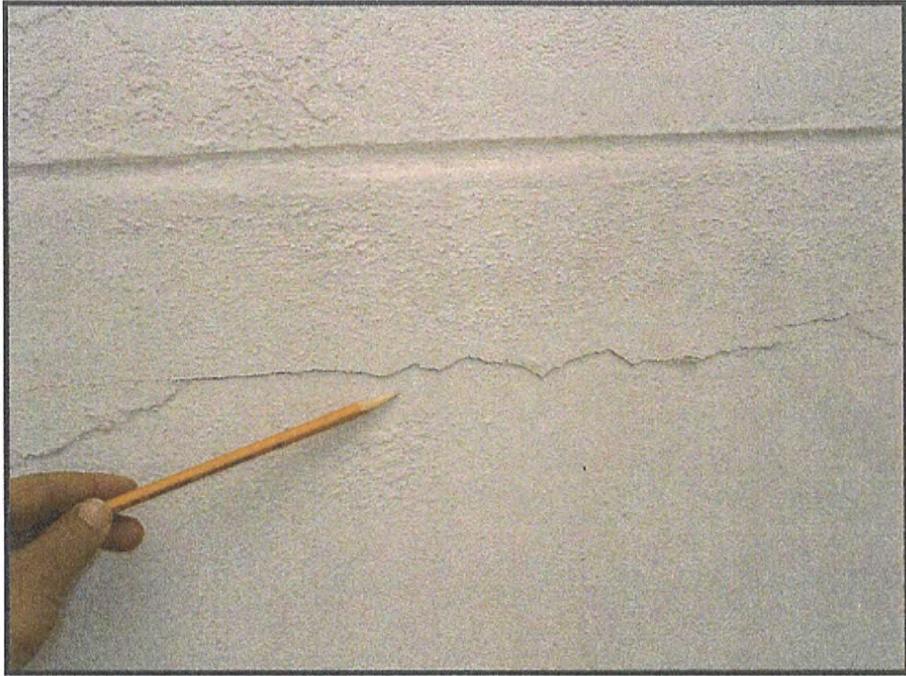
Step cracking along East wall at Southeast corner of building.
